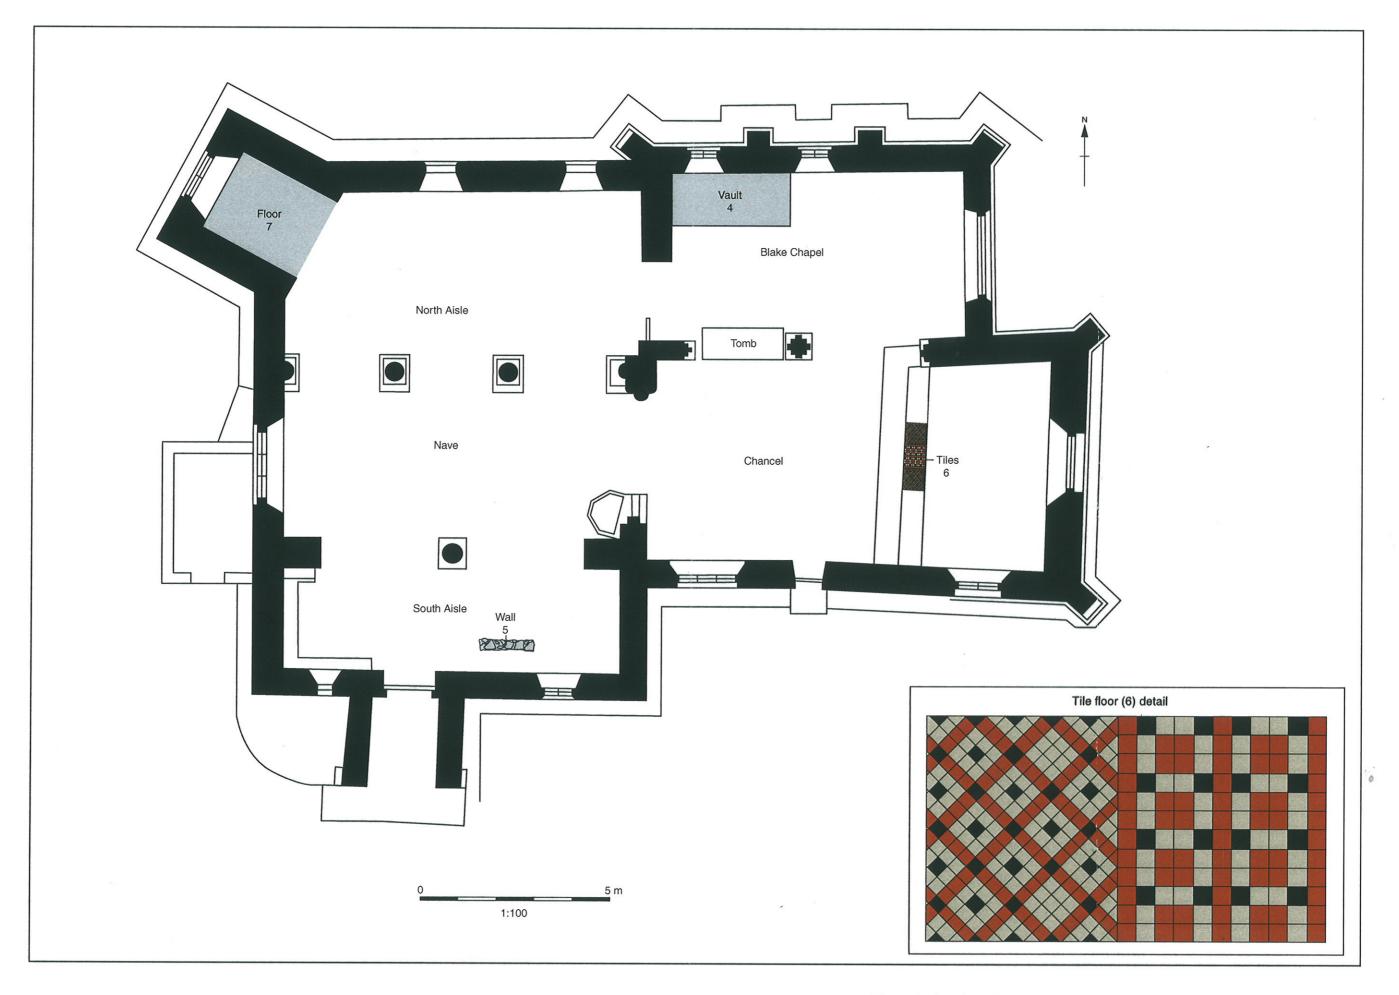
Site plan of features exposed in St Mary's Church, during floor reduction
